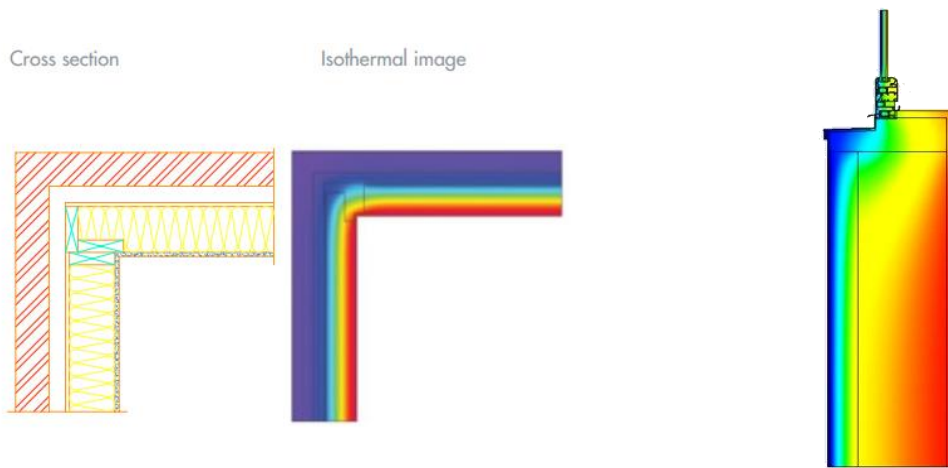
Junction with an external wall – normal corner (left) and Junction between an external wall and window frame (right) [40], [41]
